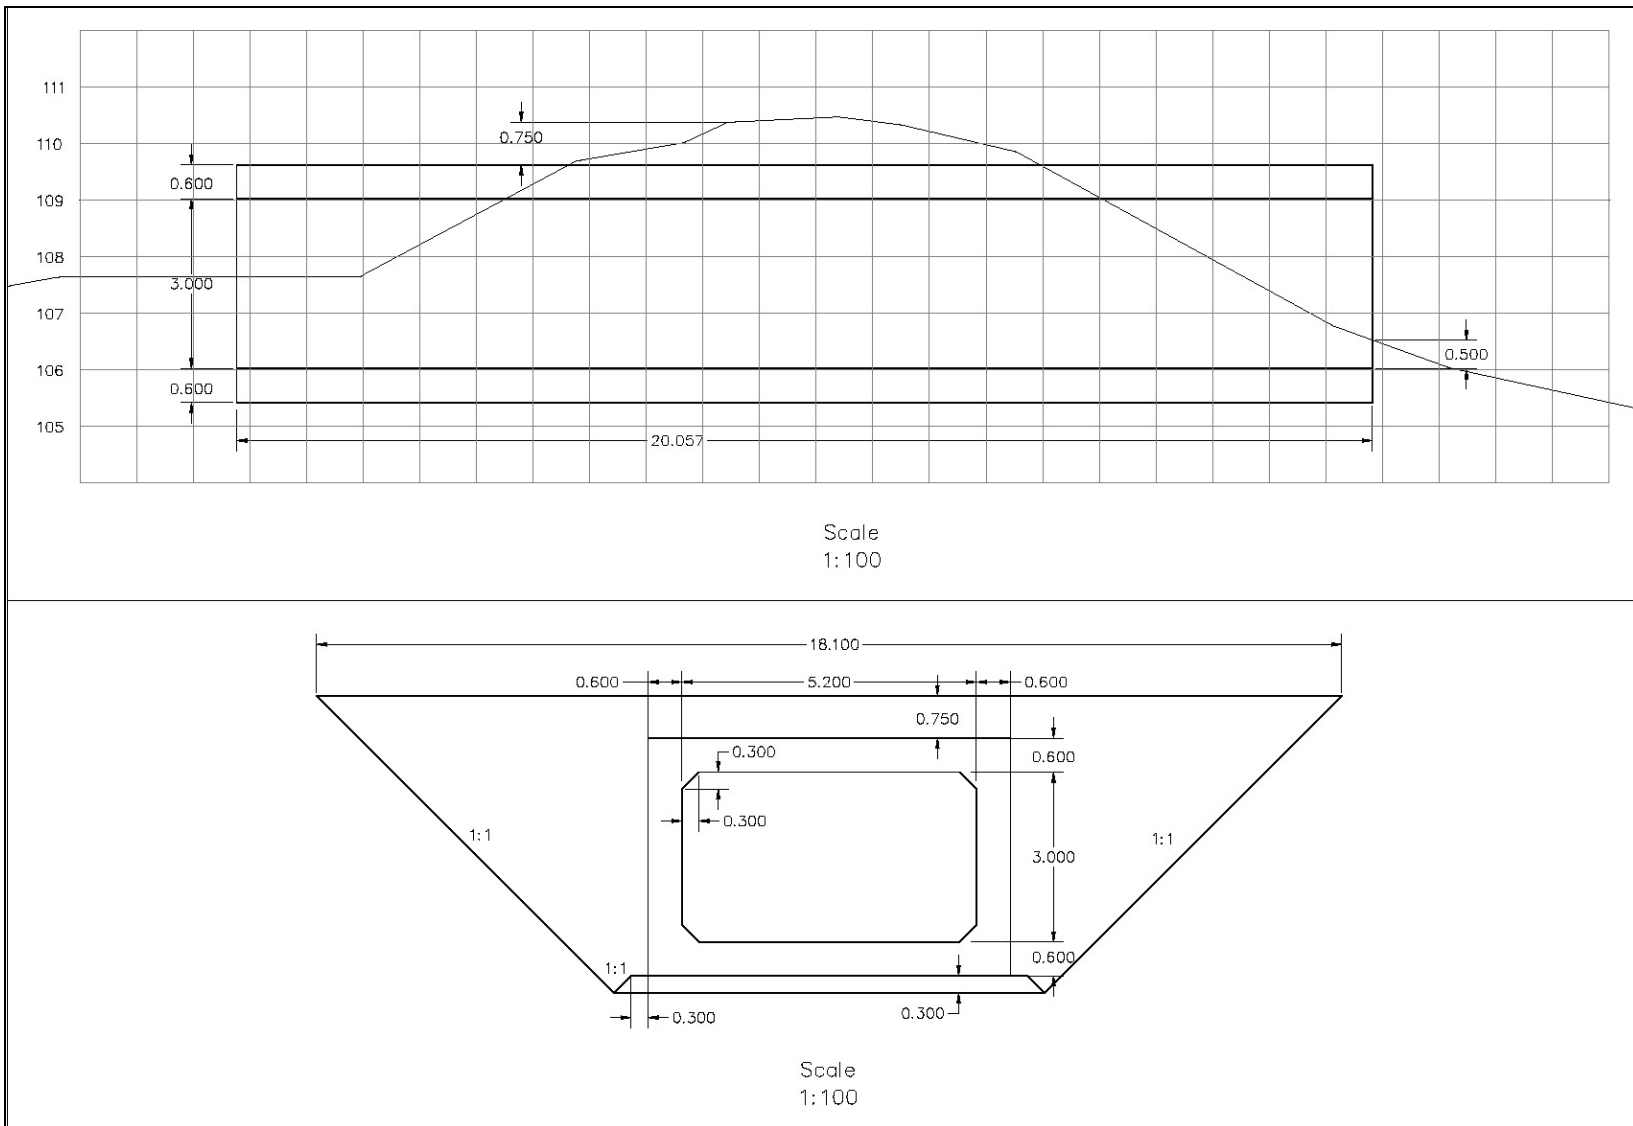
Proposed Metrolinx 4 – North Tunnel arrangement (Draft)
